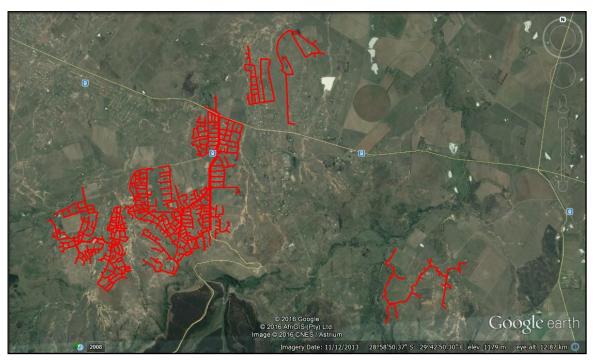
Bhekuzulu Water Reticulation Project Site Plan
